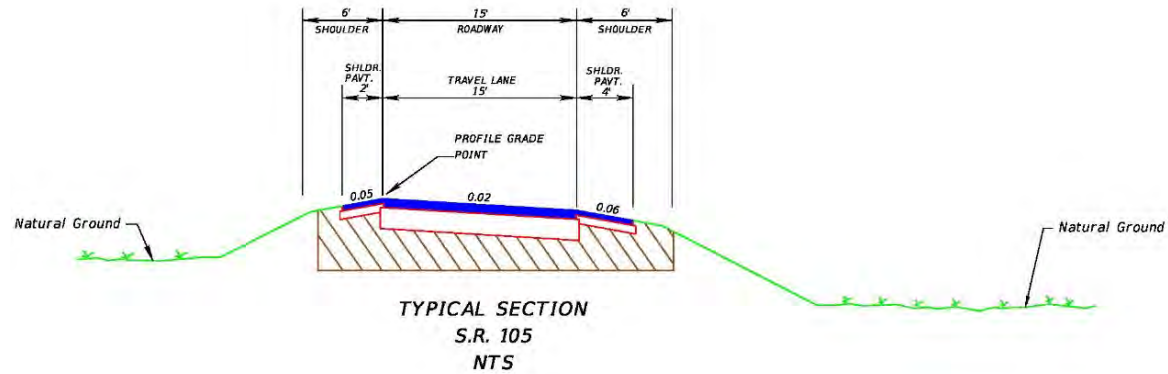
S.R. 105 Existing Typical Section (2-Lane Divided)
